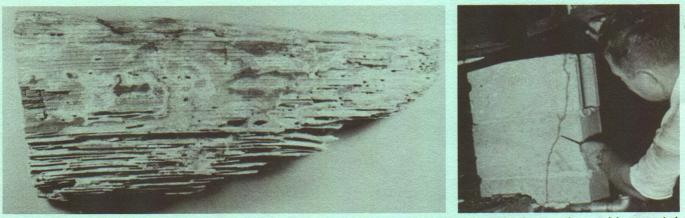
(Left) Douglas fir plank damaged by termites. Note remaining harder summerwood and debris on surface and in excavated parts of wood. Fig. 13. (Right) Termite shelter tubes built over concrete block support under wood framed structure.
